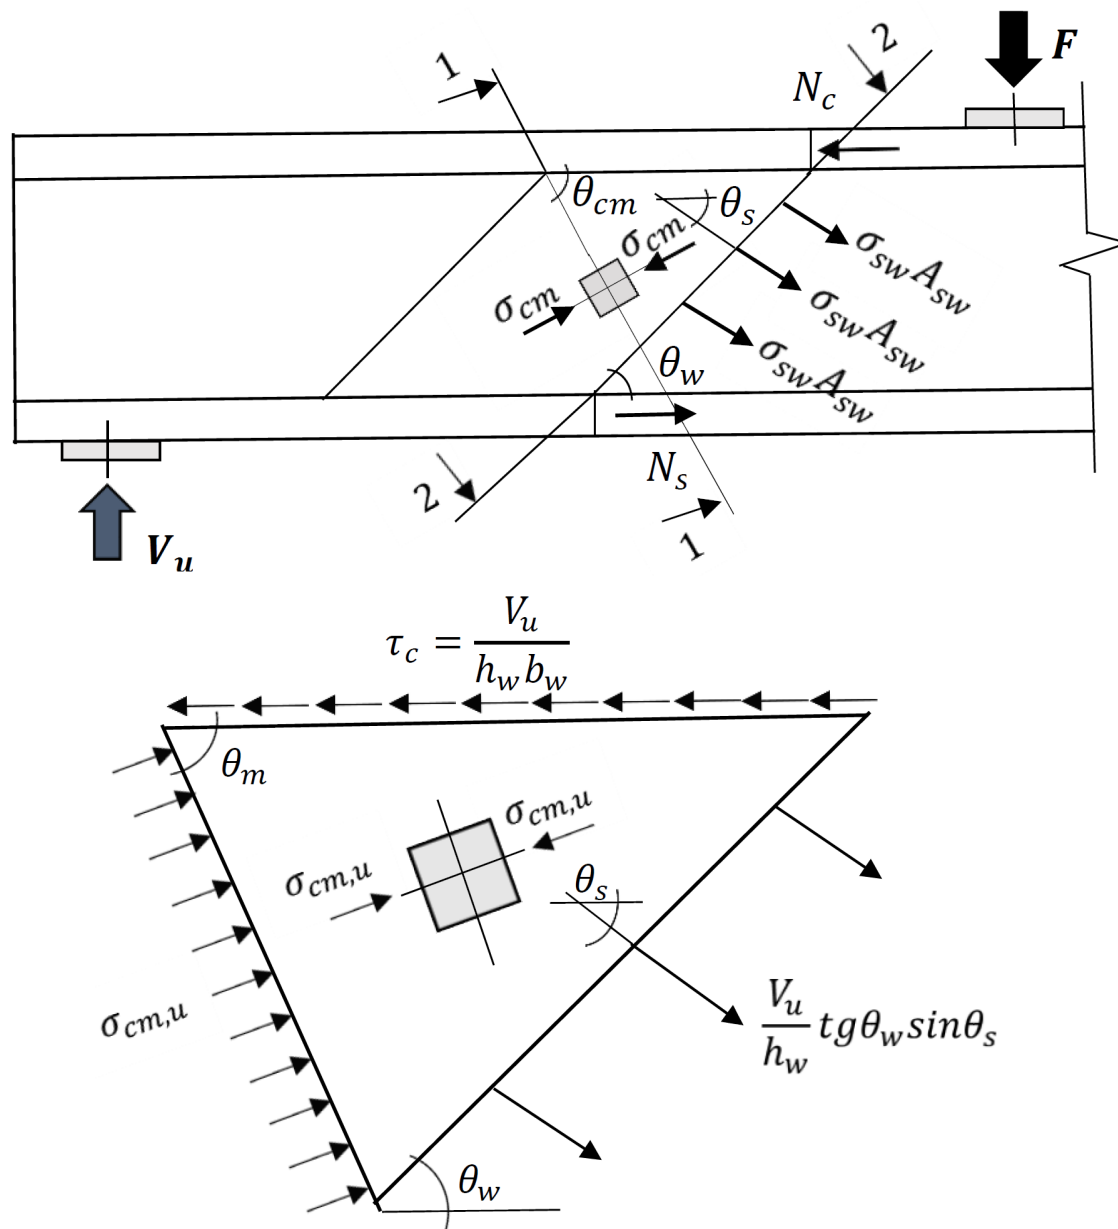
Design model of an I-beam element failure due to concrete fragmentation in the zone between inclined cracks: a - distribution of external and internal forces; b - distribution of forces in the strip
